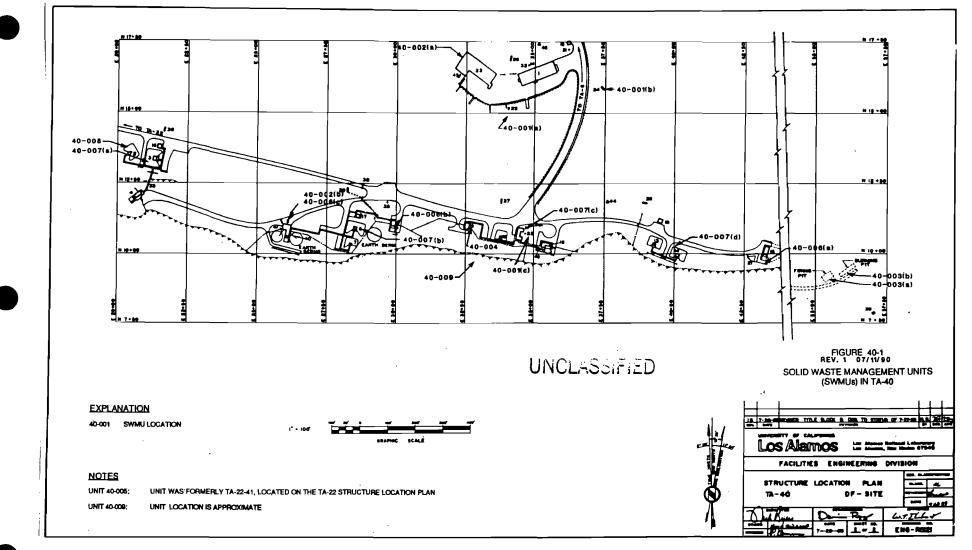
Structure Location Plan, TA-40, DF-Site
